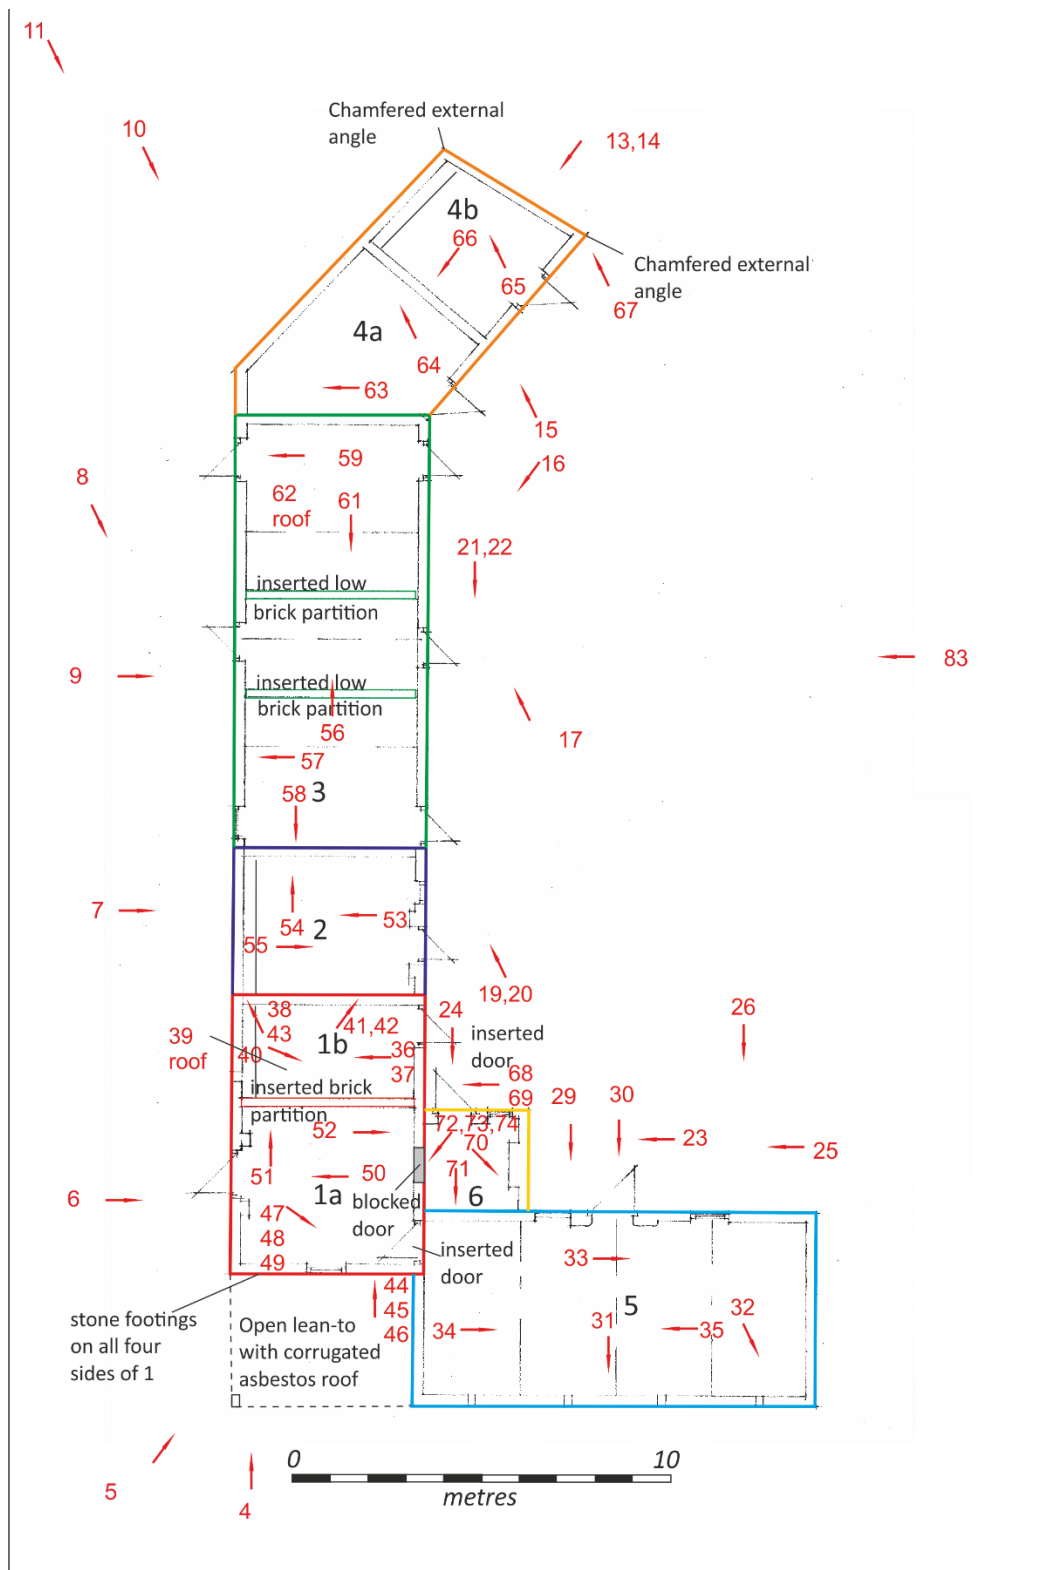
Unit 1 Ground floor plan as existing. Buildings 1-4 constructed in sequence. Building 5-6 added at unknown point in the sequence, after 1 but before 4. Numbered arrows show direction of photographs. See Appendix 1
